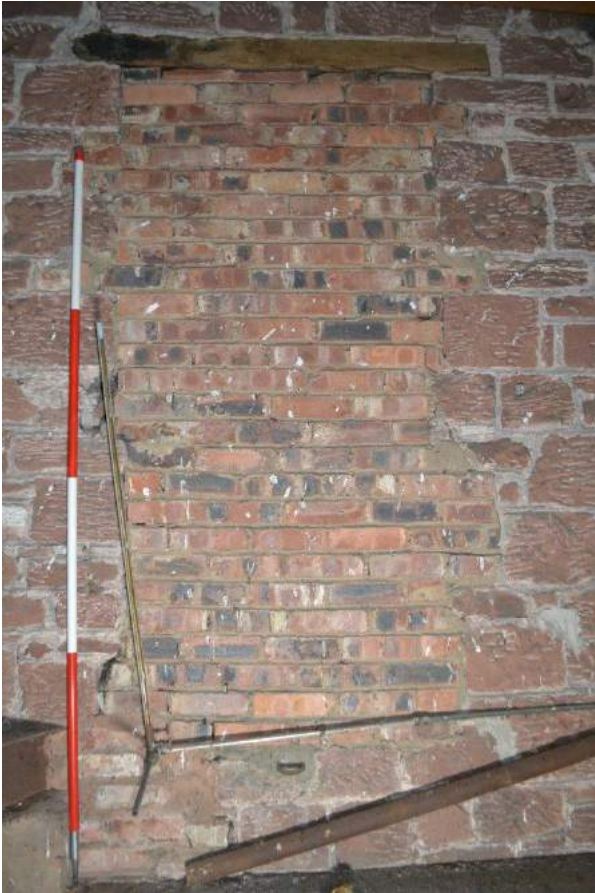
Detail of bricked-up door way into the first floor of the farmhouse
